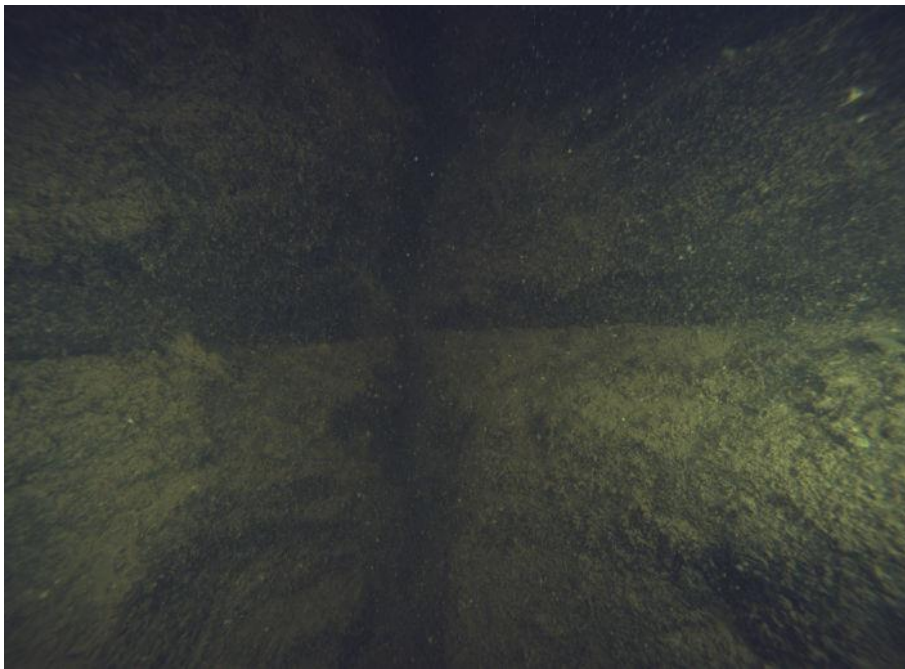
Western interface of outlet tower and dam wall near surface level. No obvious separation between the outlet tower and dam wall was detected.
